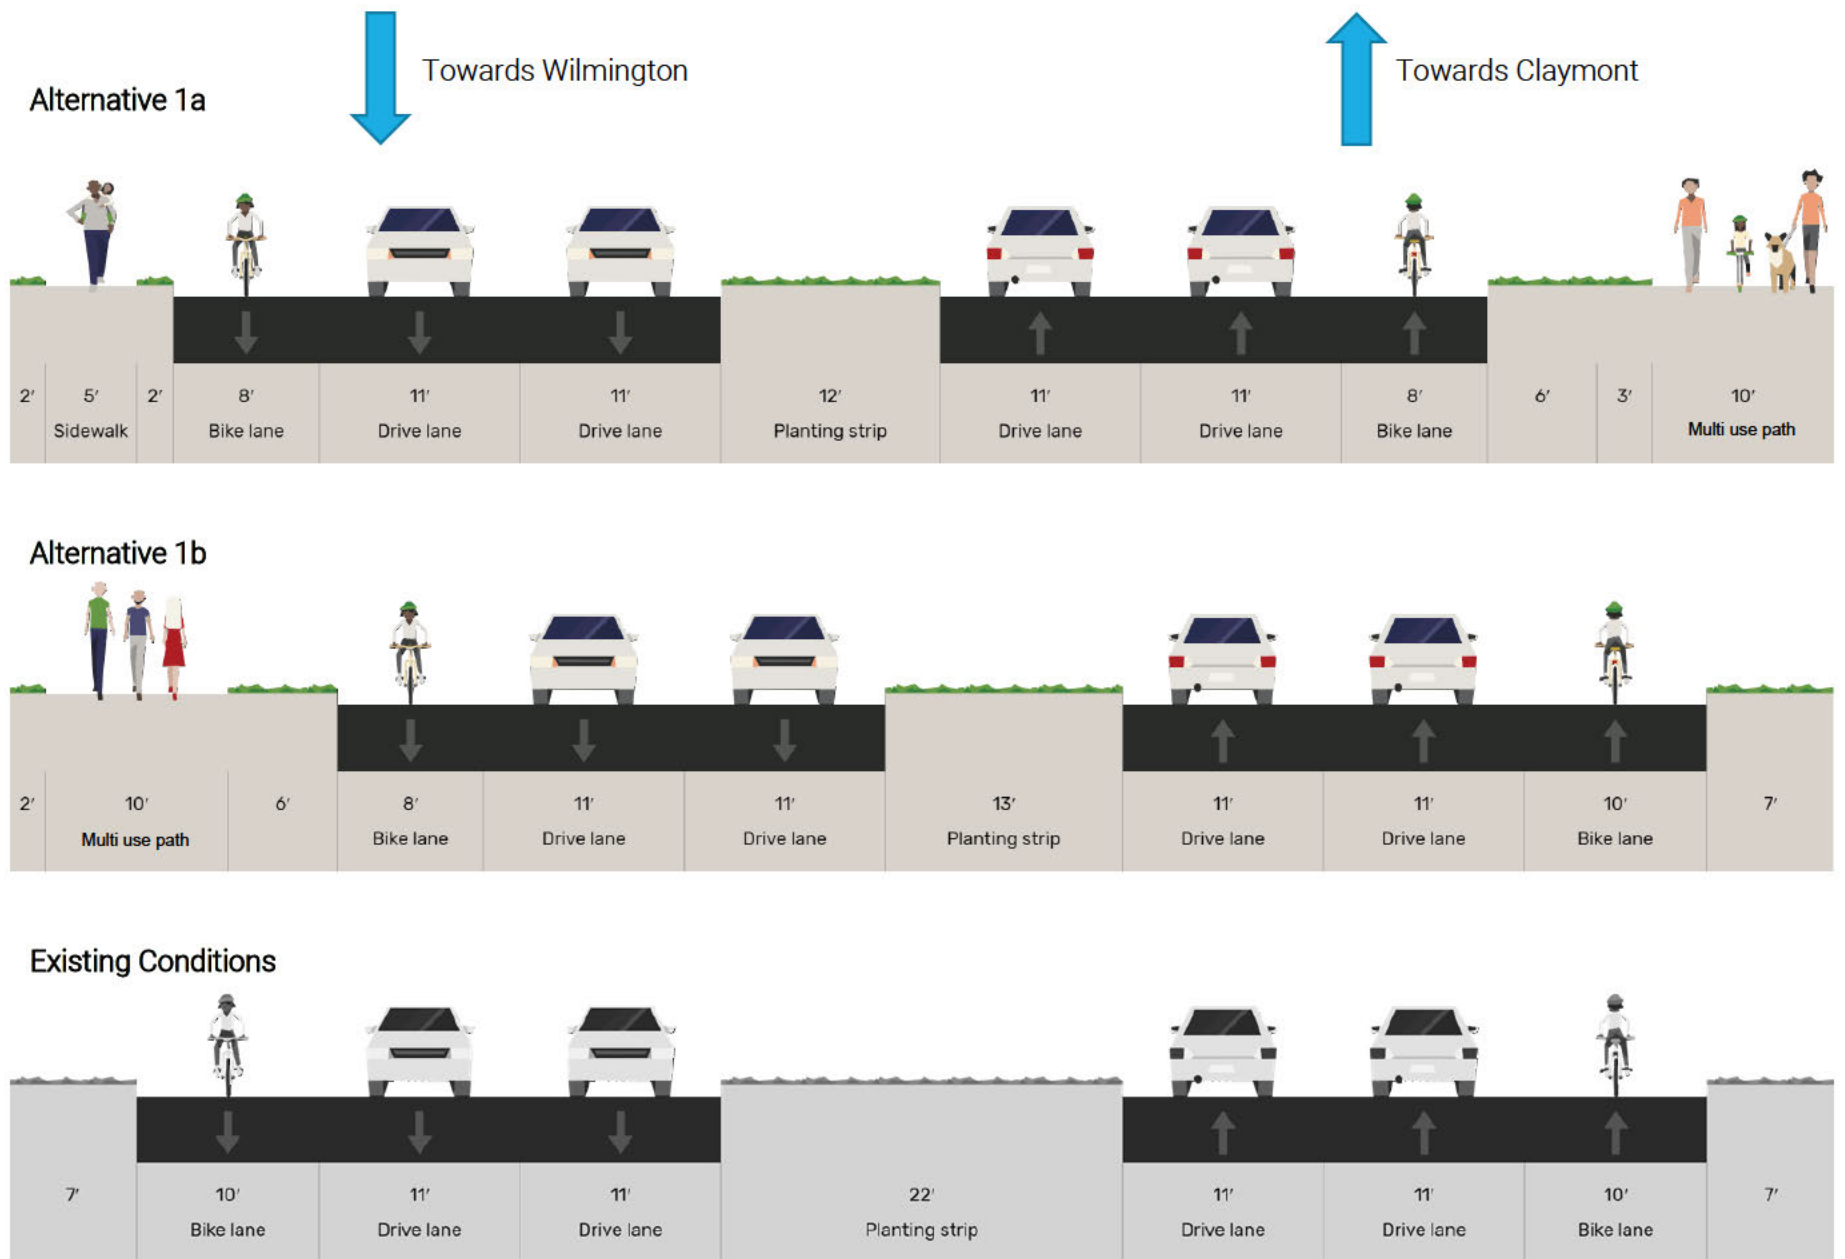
Alternative 1a and 1b typical section with existing section for comparison
